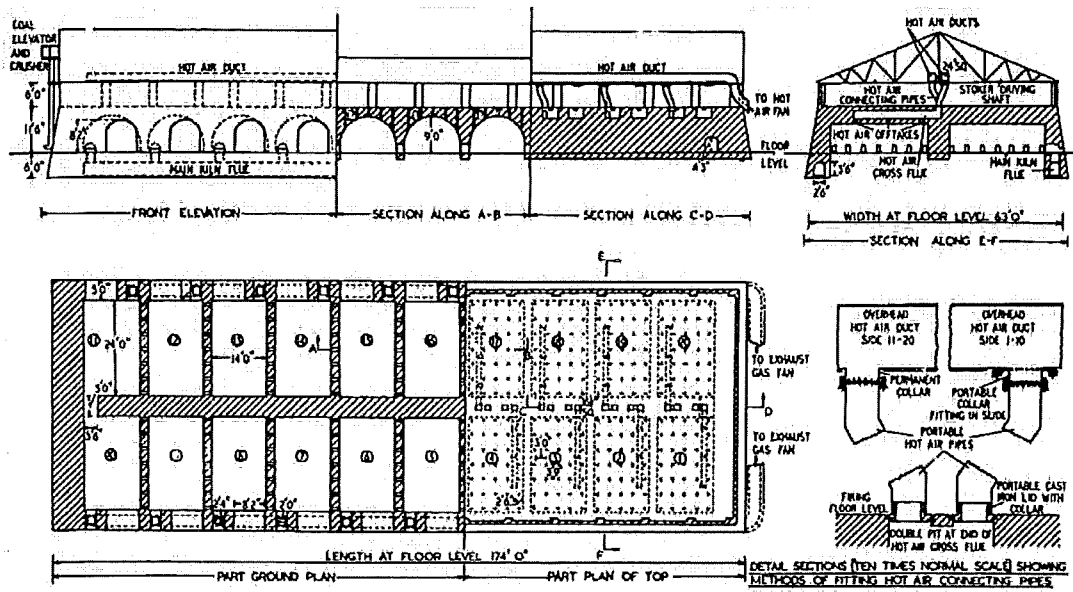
Plan, sections, front elevation and details of a Staffordshire kiln.
